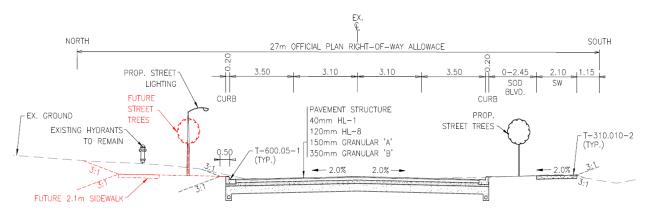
Passmore Avenue Mid-Block Typical Section
